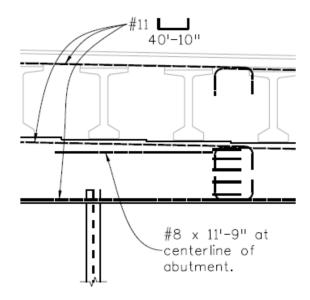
Example 1: Rebar not controlled by concrete dimensions
